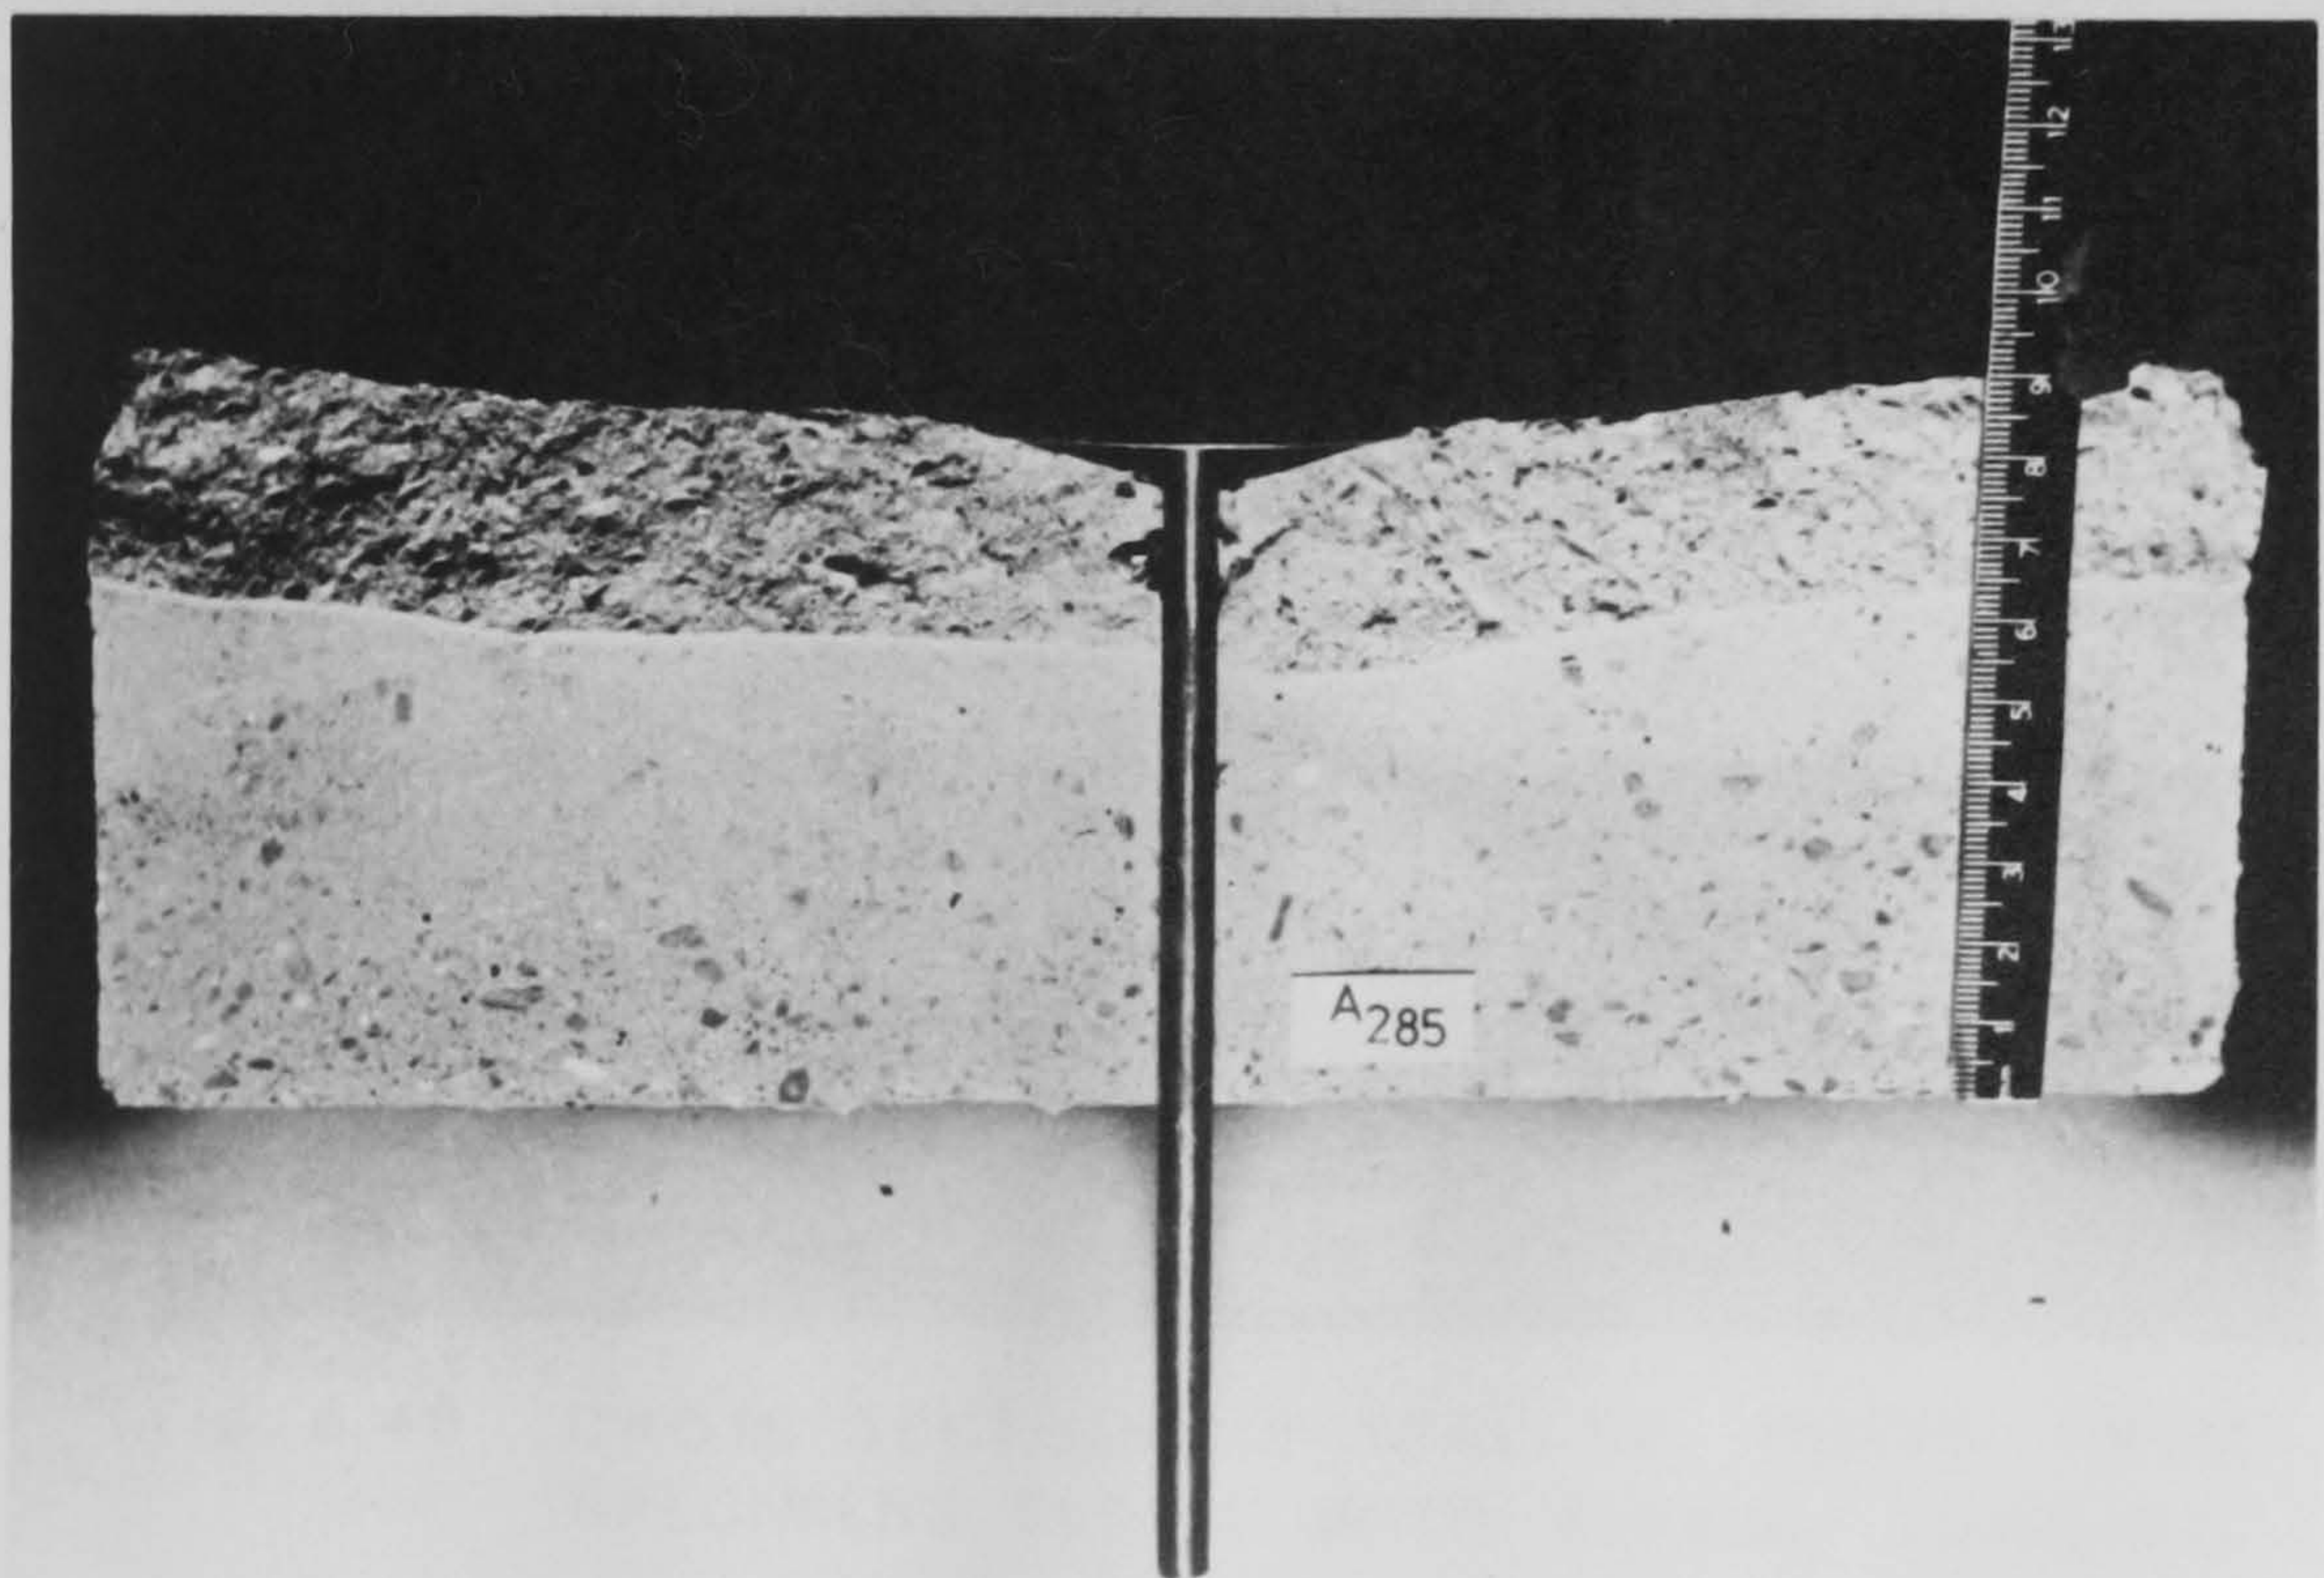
CROSS SECTION OF THE SPECIMEN TESTED WITH BIAXIAL LOADING
